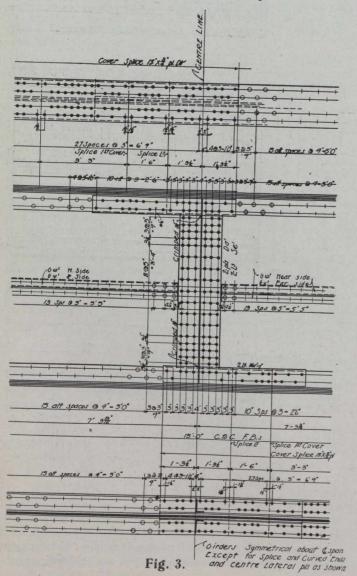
shows splice at centre of main girders. This was necessary on account of difficulty in transporting the whole girder from unloading point at the bridge side. No difficulty was experienced in bringing together the two halves of the girders in the rather unwieldy splice.
